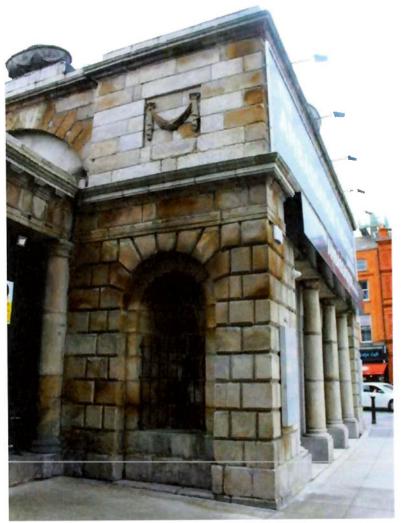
Return wall to front elevation. Proposed works are repointing open joints, replace decaying render swags and gentle cleaning to lighten staining in the niche.
